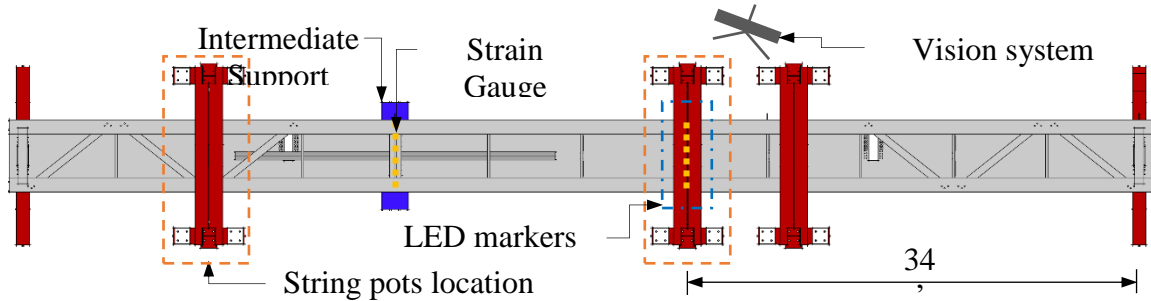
Instrumentation Layout on Steel Girders - Plan View
